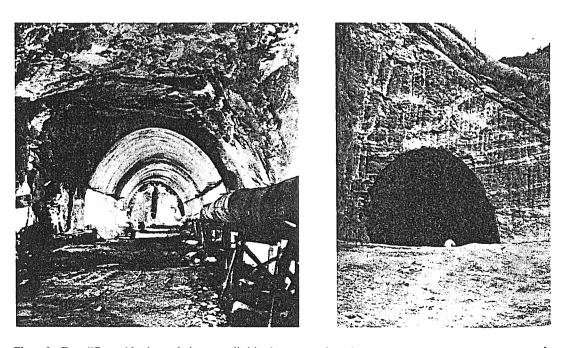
Two different blasting techniques applied in the same rock at the construction of adjacent roadway tunnels
